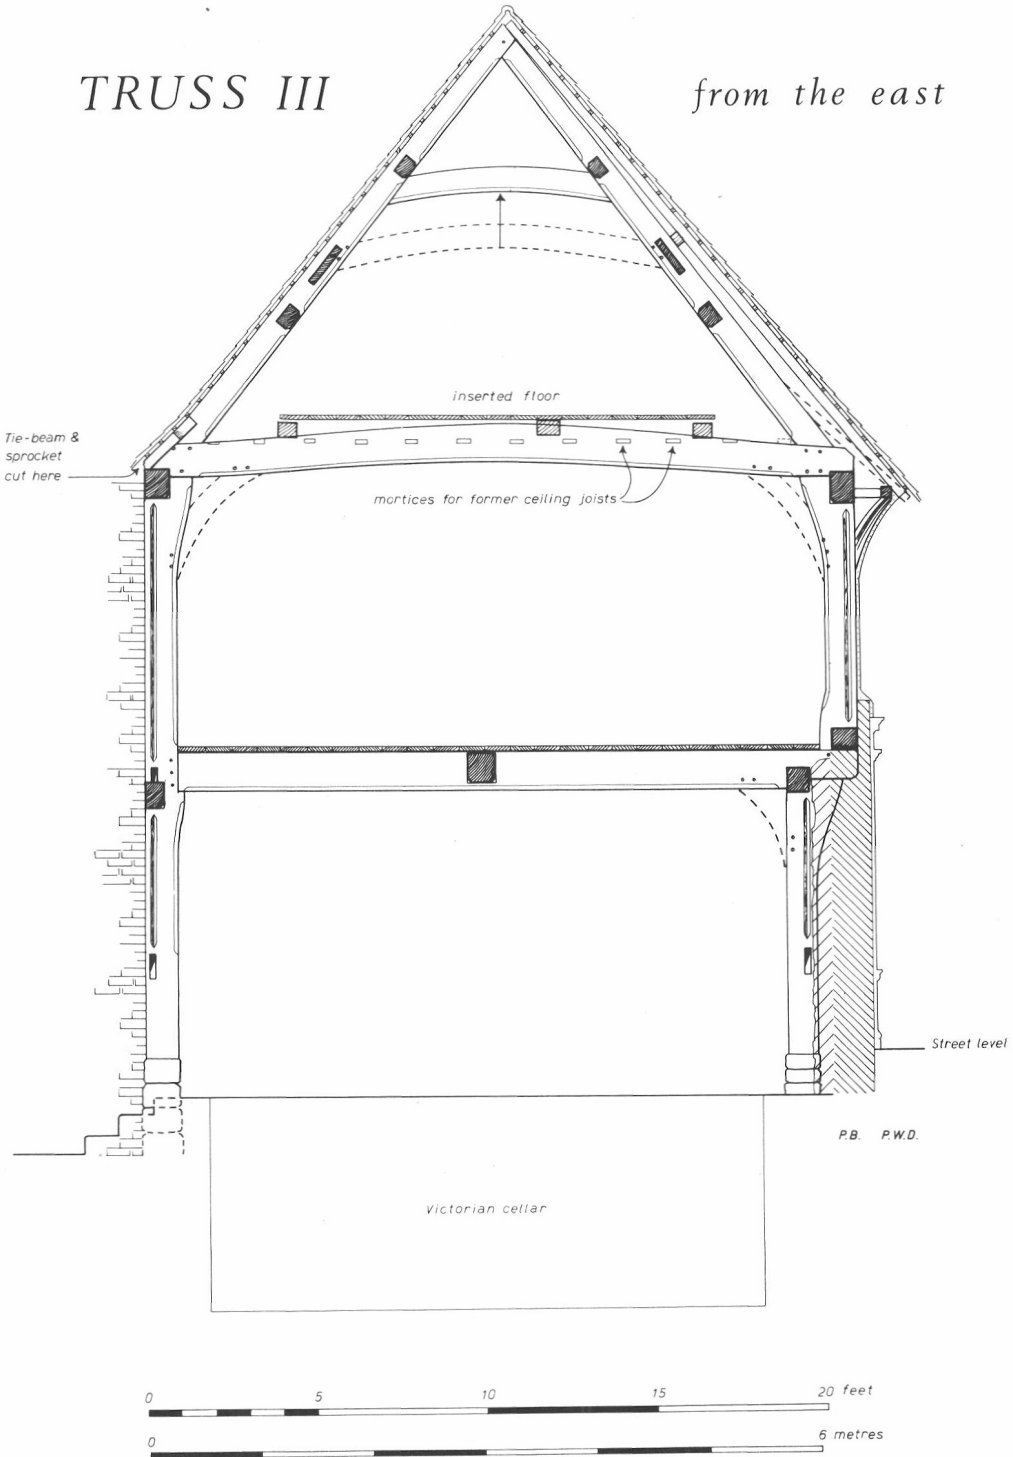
The Peacock Inn: the timber-framed building—Truss III
